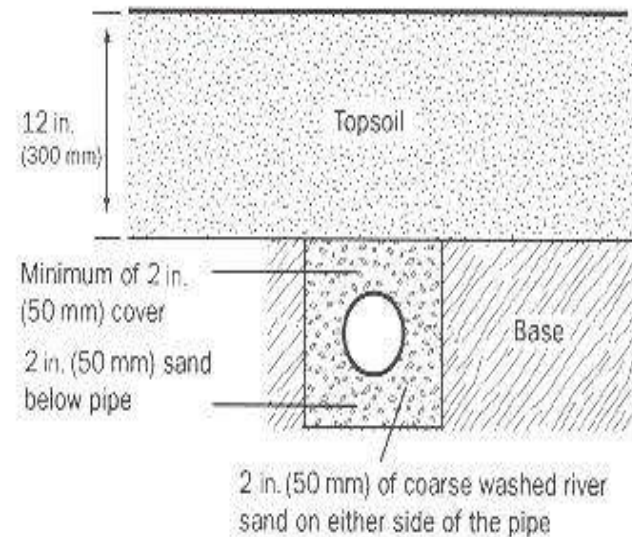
Subsoil drain cut into the base below the topsoil, with 2 in. (50 mm) of sand surrounding the pipe on all sides.
